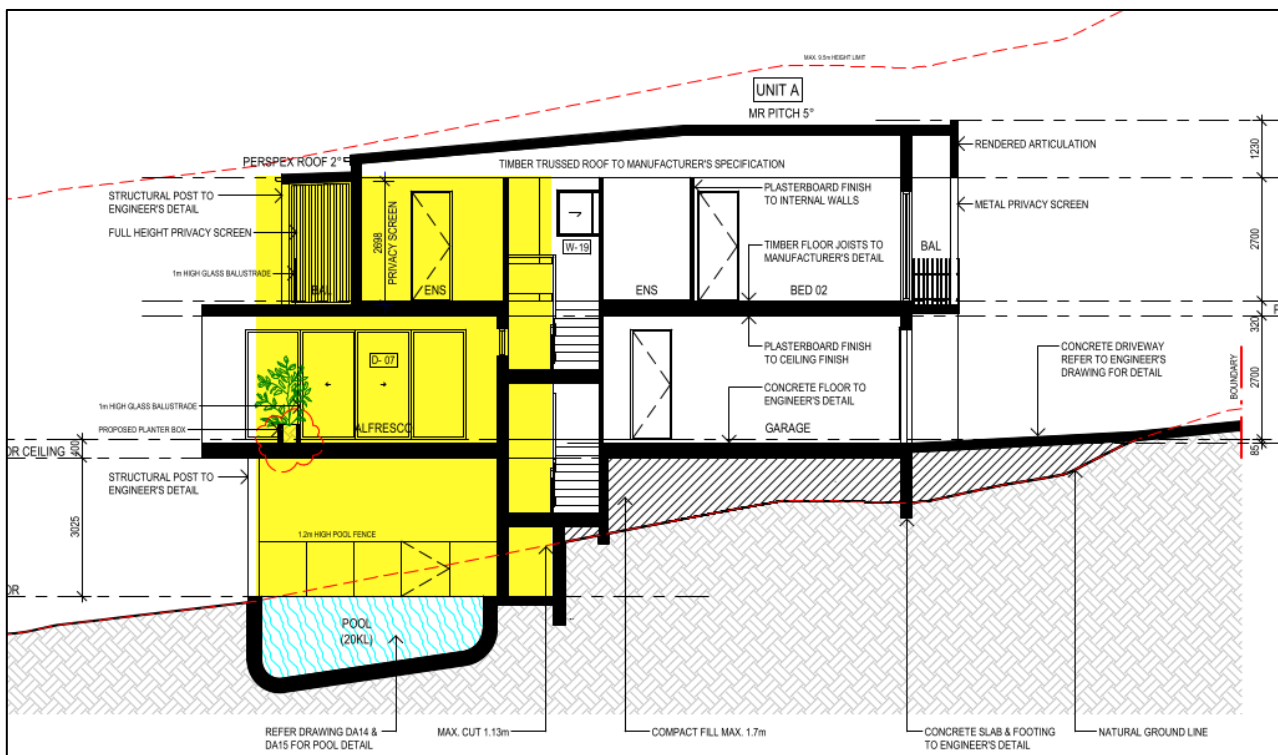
Section plan of dual occupancy. Highlighted section shows portion that is three (3) storeys
